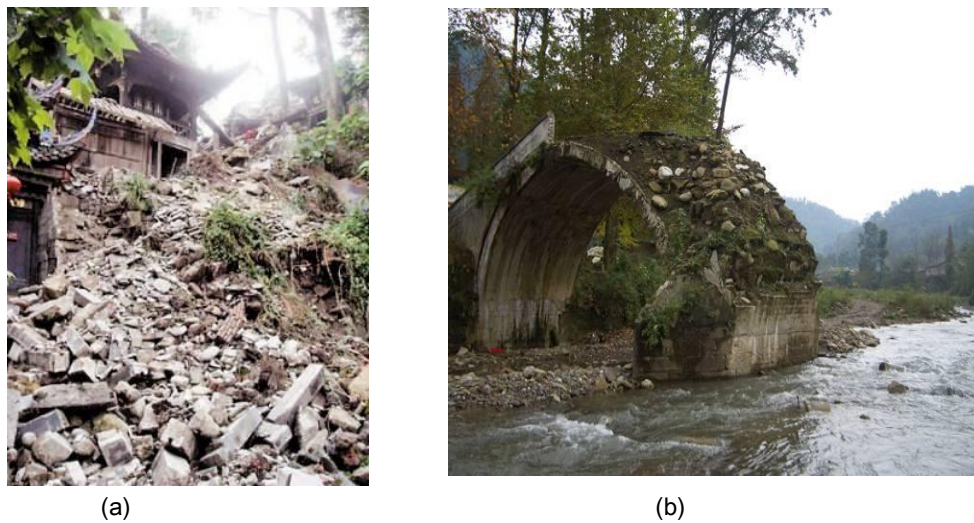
"Damaged historic buildings in Wenchuan earthquake (2008). (a) "Er Wang" Temple (b) Sino-French Bridge.
